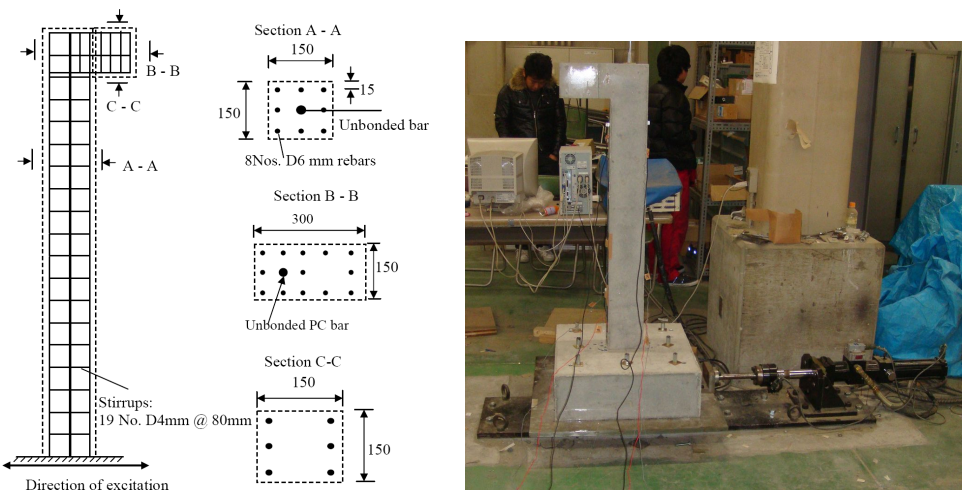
Elevation and cross section of a typical column and the experimental set-up.
